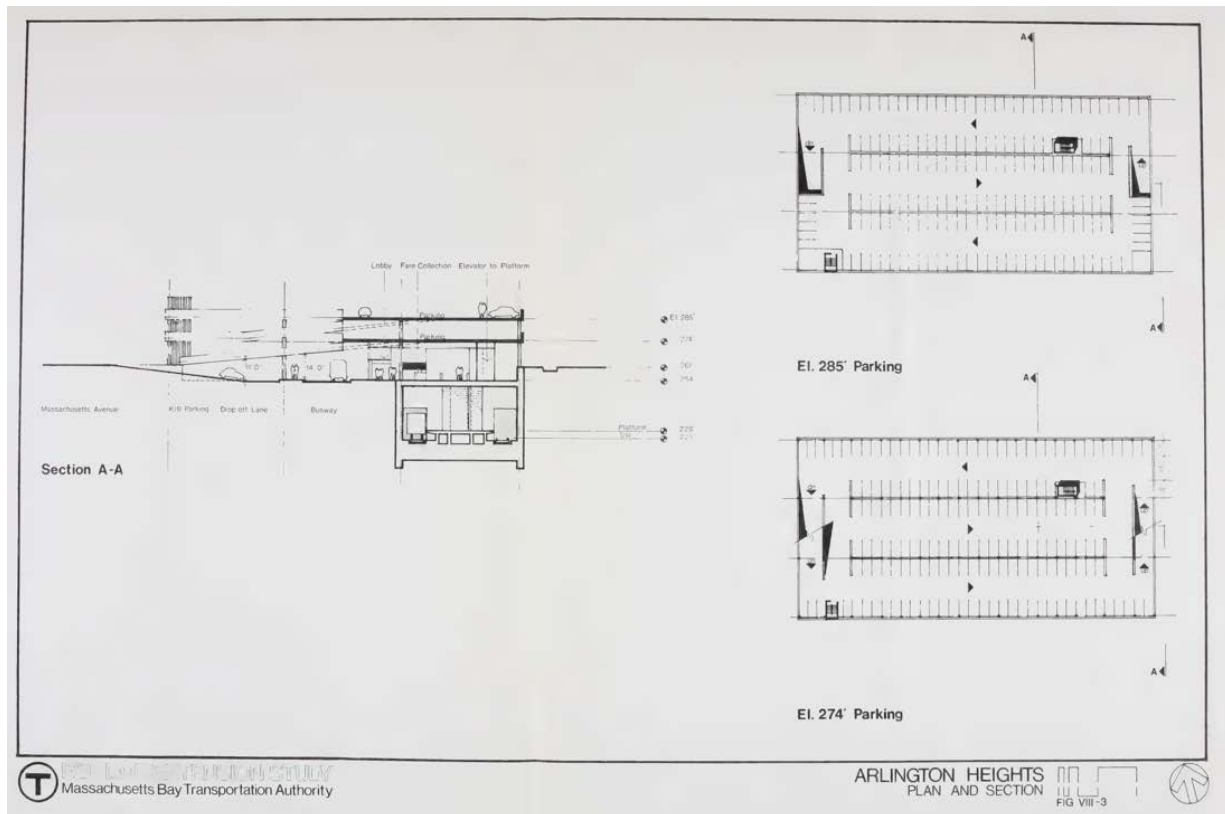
Arlington Heights station plan and section view of parking garage. *Source: EIS VII
